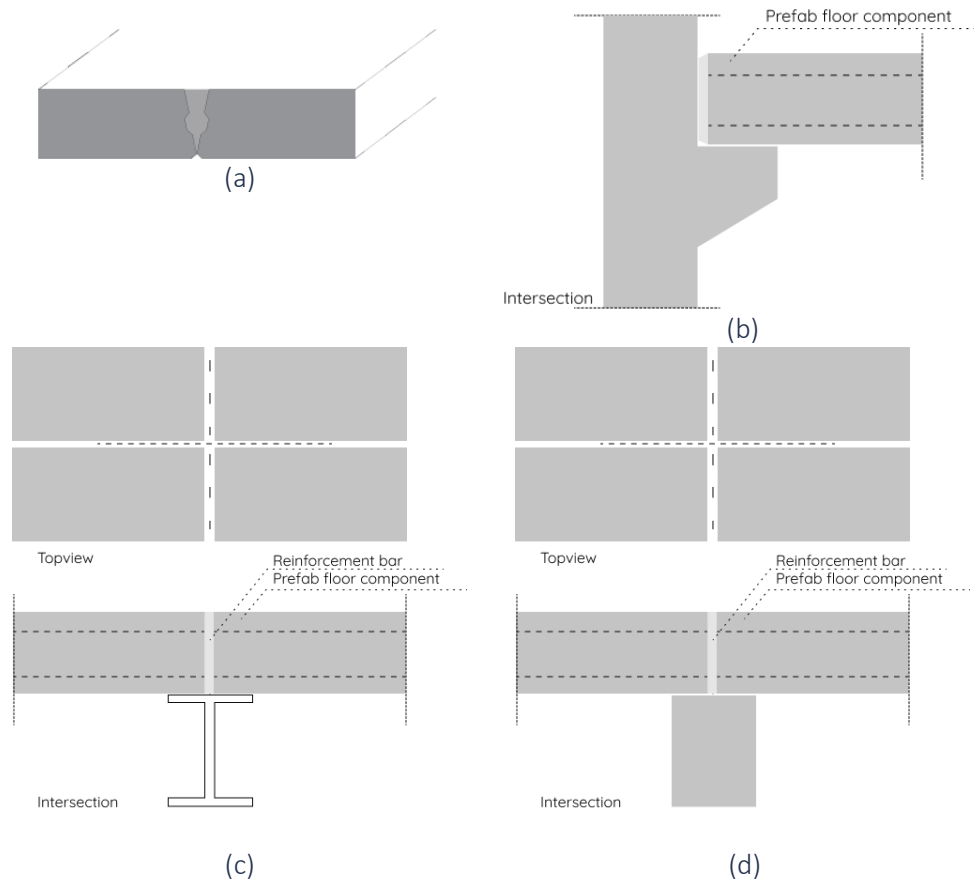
Example connections between beam/column and floor components with mortar filled. a) prefab floor – prefab floor b) prefab column corbel – prefab floor component c) steel beam – prefab floor component. d) prefab beam – prefab floor component.
